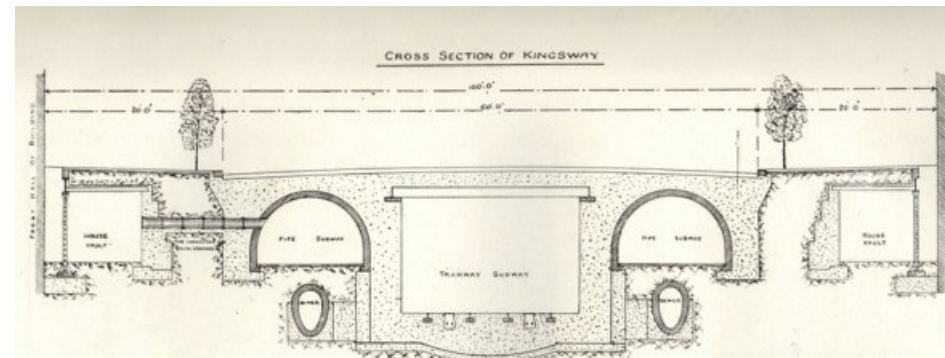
Cross section plan of Kingway, showing the generous width of the new road, and the tramway and pipe subways that were integrated into its design.
